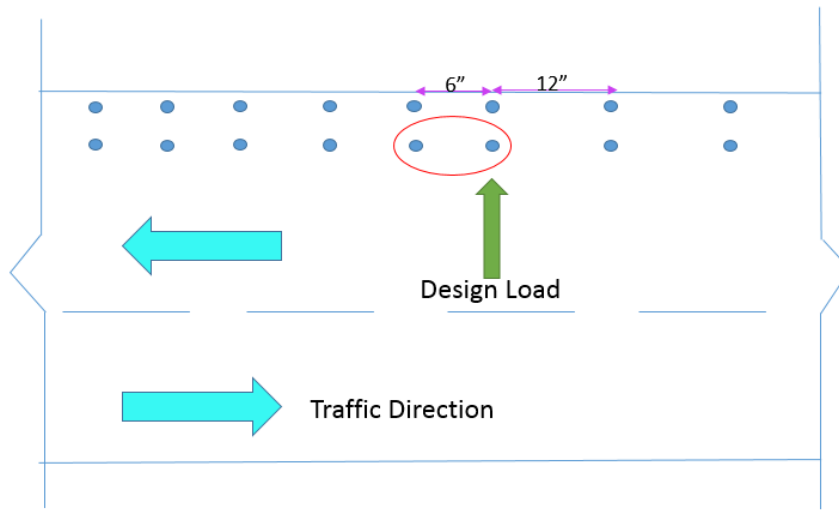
Schematic top view of an anchor group effect on a bridge rail
